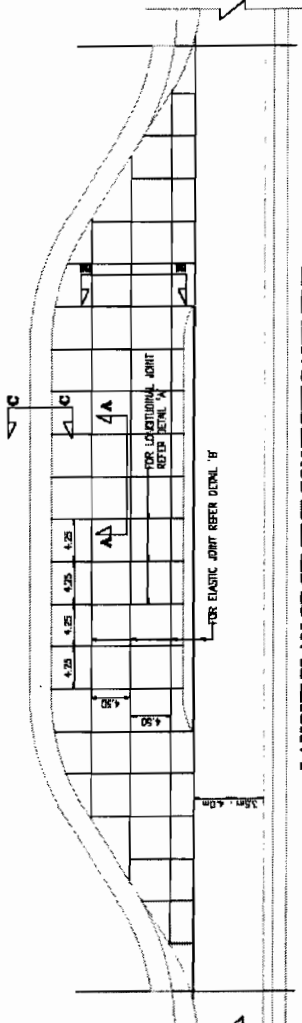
DETAILS OF TRUCK LAYBYES (SHEET 1 OF 2)
